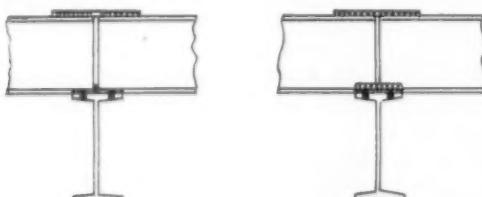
Fillet Welds on Lower Stringer Flange Supplemented by Rivet Welds (left) and Same Connection Supplemented by Short Bars on Top of Flange
